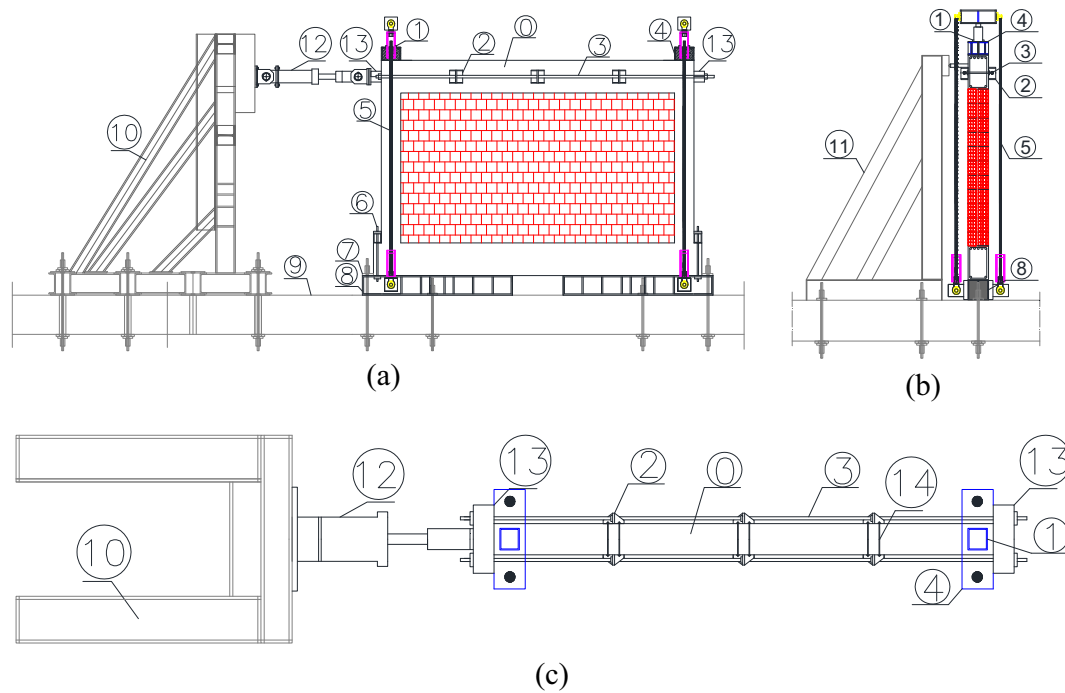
Layout of the in-plane experimental test set-up: (a) front view; (b) lateral view and (c) Back view. 0 – top beam, 1 – hydraulic jack (for axial load application), 2 – steel plates for horizontal force distribution, 3 – horizontal high-strength rods ($\varnothing 22$ mm), 4 – head steel shape, 5 – vertical high-strength rods ($\varnothing 30$ mm), 6 – steel rod ($\varnothing 20$ mm) connecting the RC frame to the foundation steel shape, 7 – high-strength rods ($\varnothing 30$ mm) fixing the foundation steel shape to the reaction slab, 8 – foundation steel shape, 9 – strong floor, 10 – in-plane reaction frame, 11 – out-of-plane reaction and guiding structure, 12 – servo-controlled hydraulic actuator, 13 – right and left head steel profile and 14 – 5 – transversal rods ($\varnothing 12$ mm).
